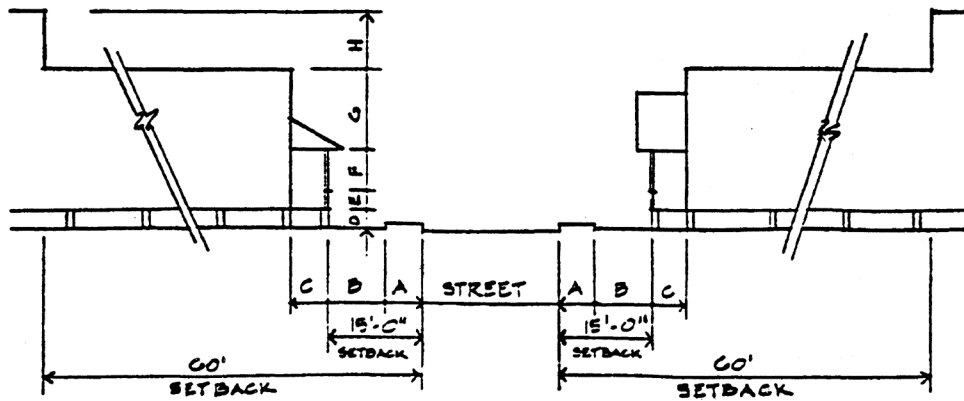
WOOD COTTAGES DISTRICT—Streetscape, Type 1
